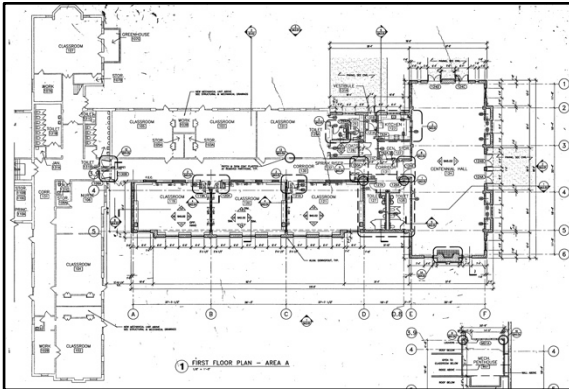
Perkins & Will floor plan showing the South Wing addition. From Ravinia School Archives.
